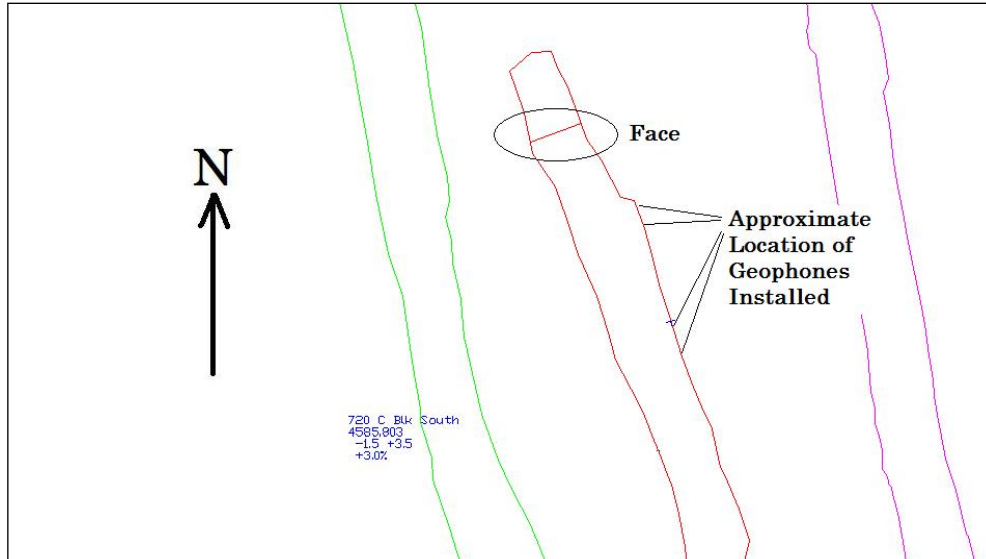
720L C Block East plan view – Musselwhite Mine
